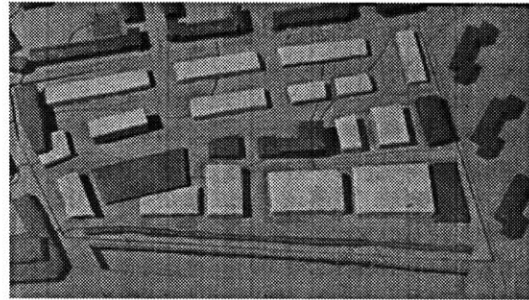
Preliminary site model, first pass, second plan. Several large industrial buildings along Southwest Corridor. Terrace Street crosses site, divides residential from industrial.
